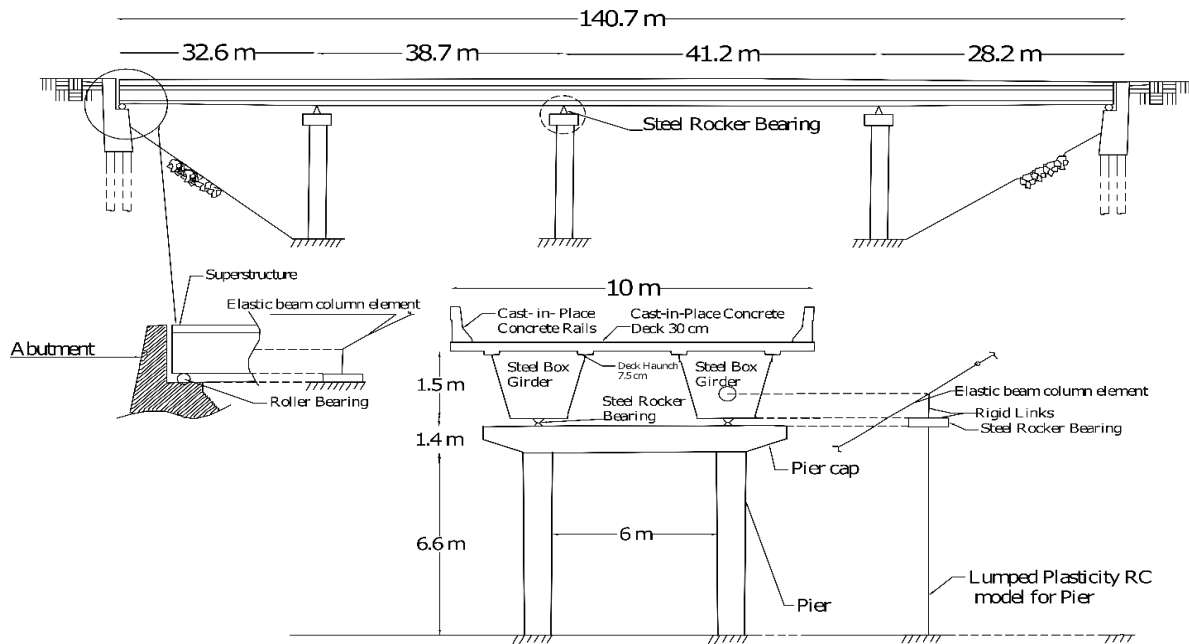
Cross-sectional view of considered steel box girder bridge
